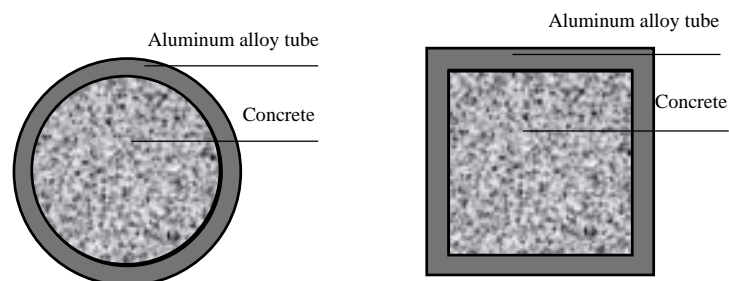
Typical cross-sections of concrete-filled aluminum alloy tubes
